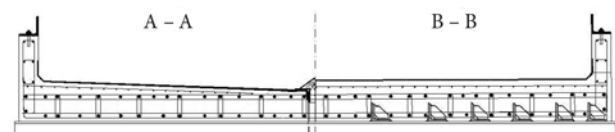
Cross-section of deck slab: in-between cross beams (A-A) and over cross beam (B-B)
